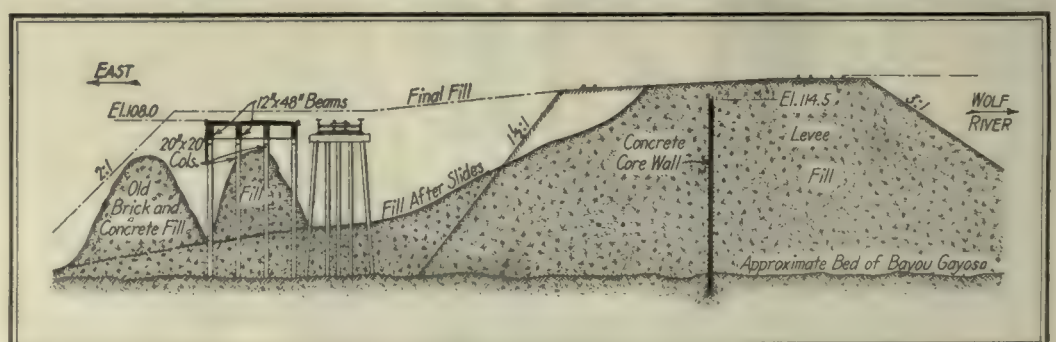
FINAL FILL WILL ENGULF SITES OF BOTH CONCRETE BRIDGE AND RAILROAD STRUCTURE
